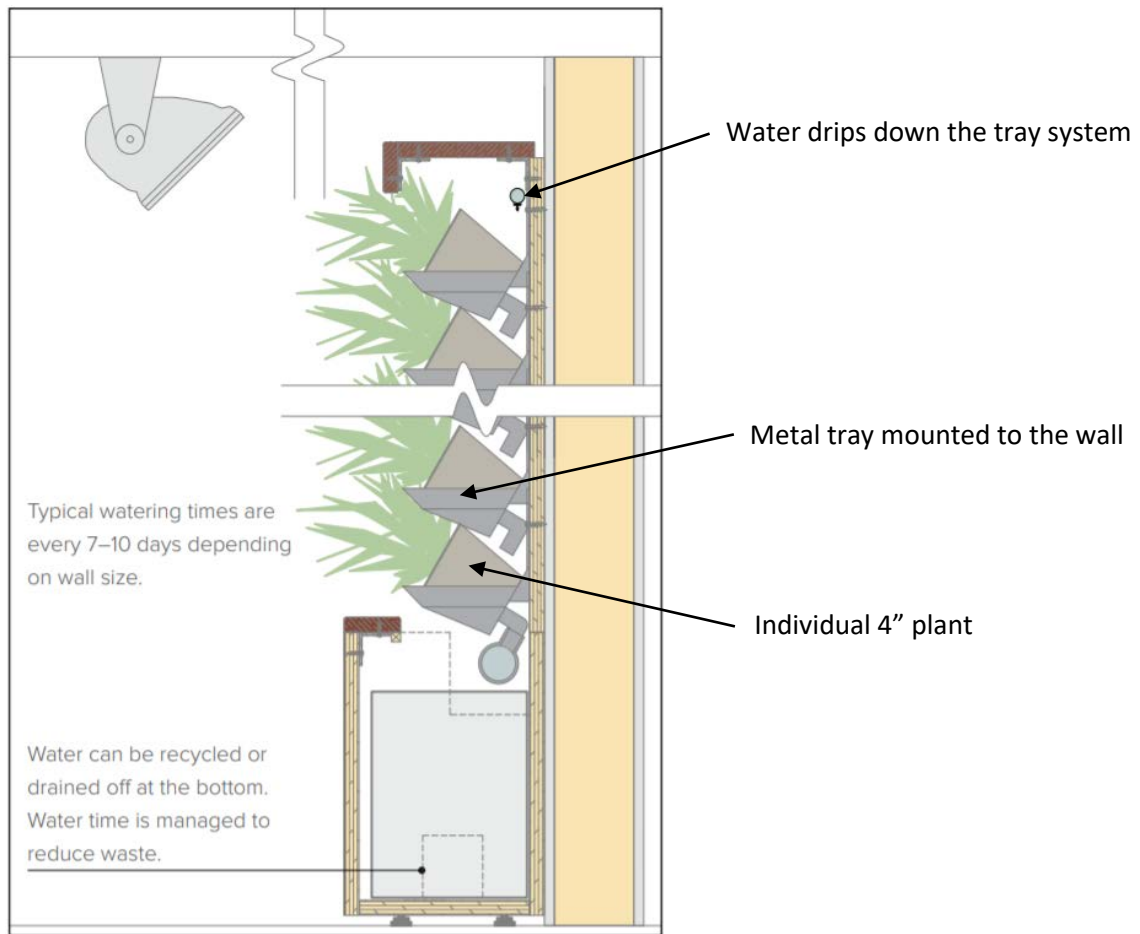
Gsky® versa wall section diagram (Gsky, 2017)
